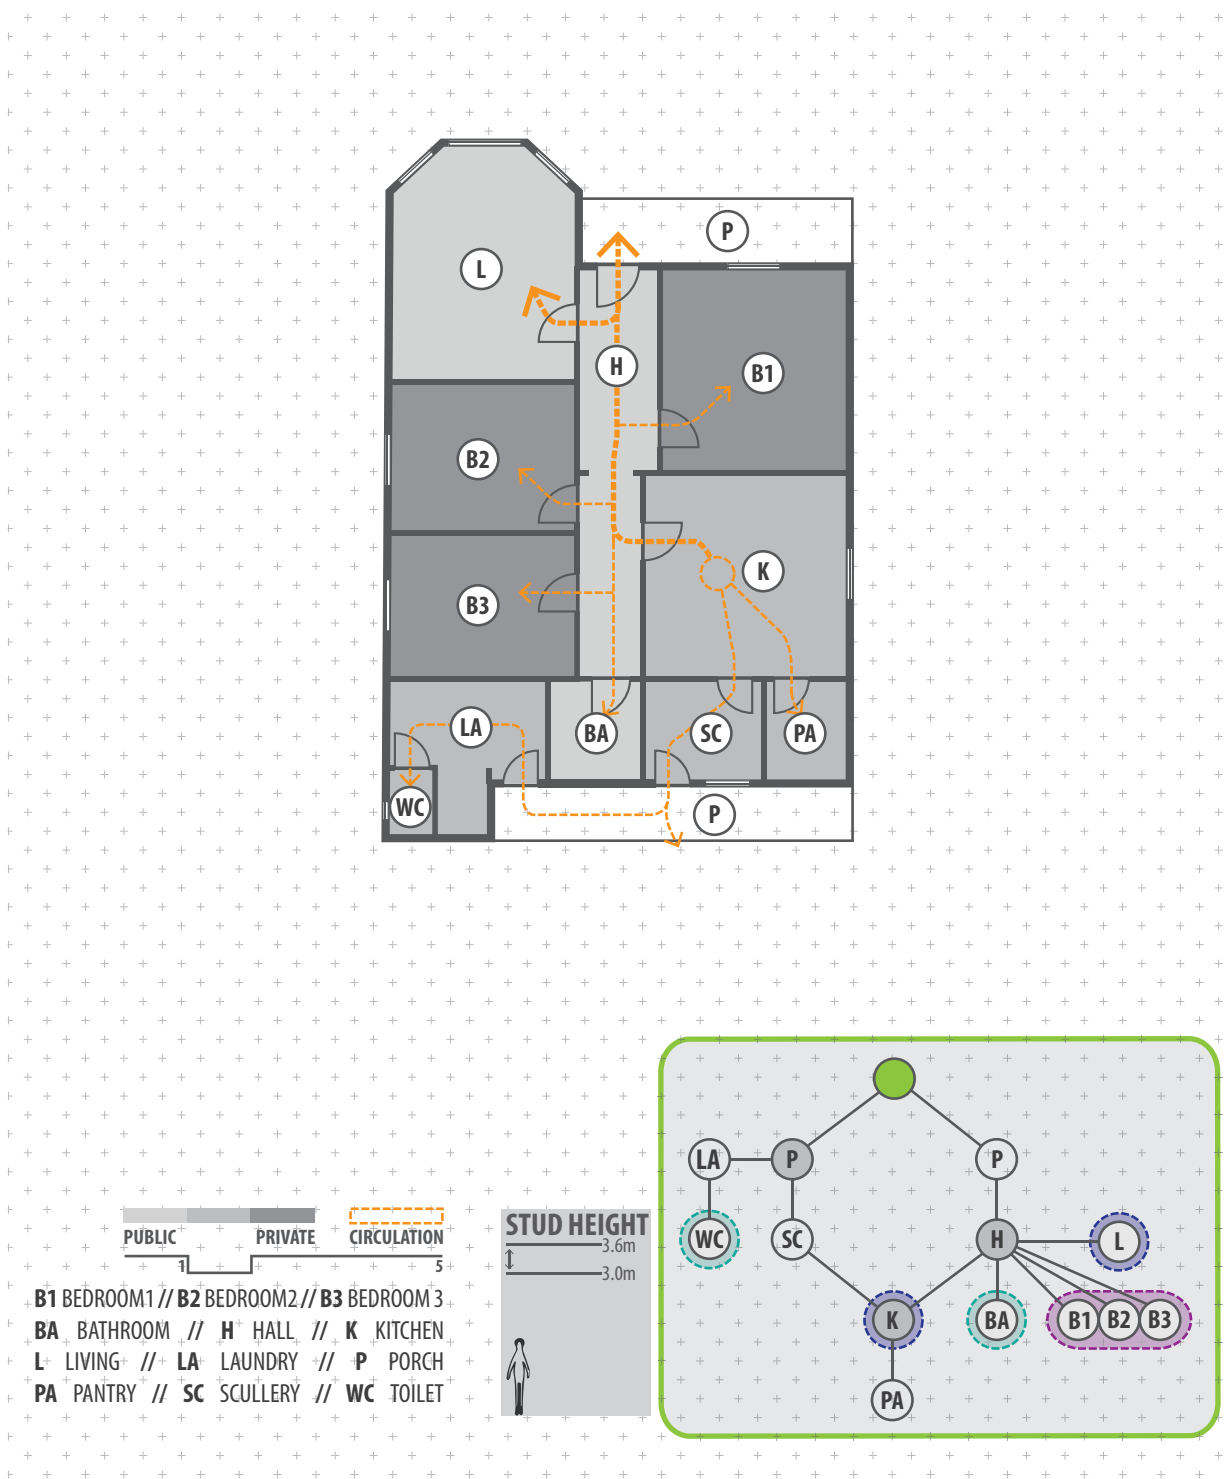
// The villa plan usually features an entrance at the front centre of the building. Inside, a central corridor runs the length of the building before terminating at the service spaces at the rear. The two street facing rooms were often defined as the master bedroom and the living room, whereas the middle of the building usually saw the placement of one or two supplementary bedrooms. Service spaces consisted of a bathroom, kitchen and scullery and were housed in a lean-to at the building's rear. As the villa evolved, these spaces grew to include the toilet and laundry, however in early models these two spaces were located outside of the primary building.
